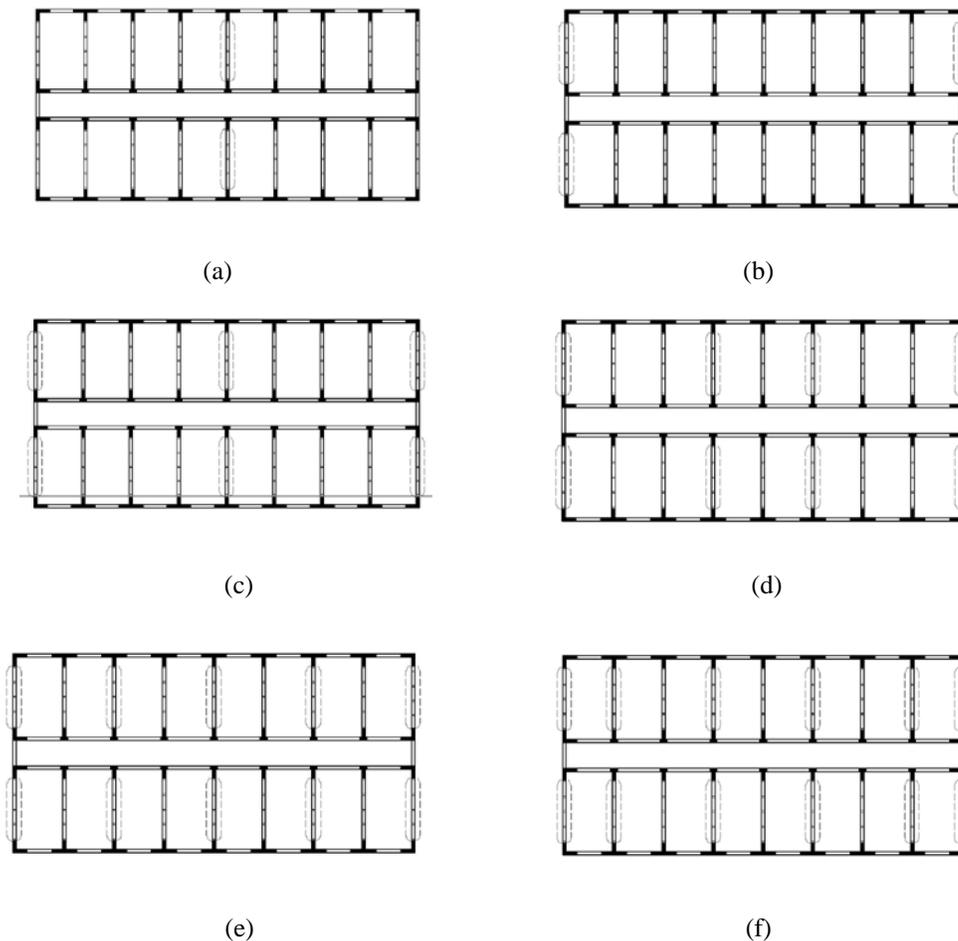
Plans layout of multi-ribbed composite wall with low yield strength steel panels: (a) 2 pieces of wall; (b) 4 pieces of wall; (c) 6 pieces of wall; (d) 8 pieces of wall; (e) 10 pieces of wall; and (f) 12 pieces of wall.
